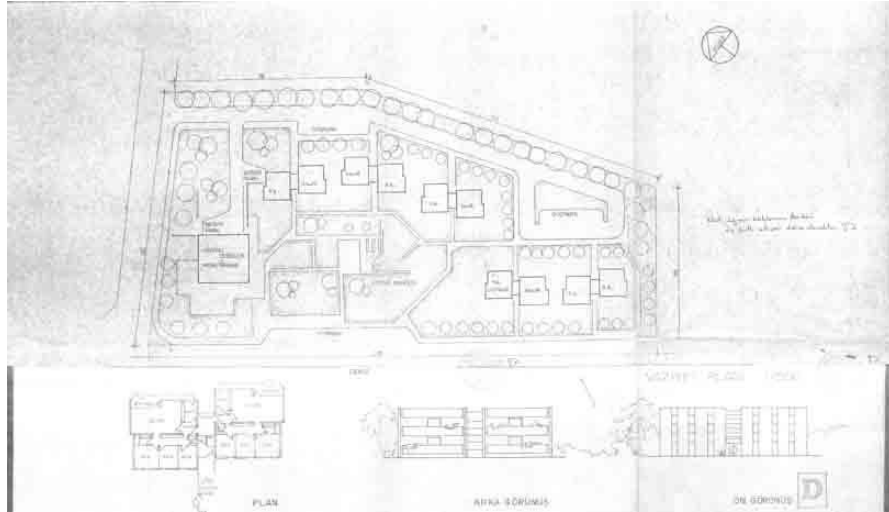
Site plan, plan and facade diagrams of apartment lodgings, 1979 (TTA Gayrimenkul Archive)
